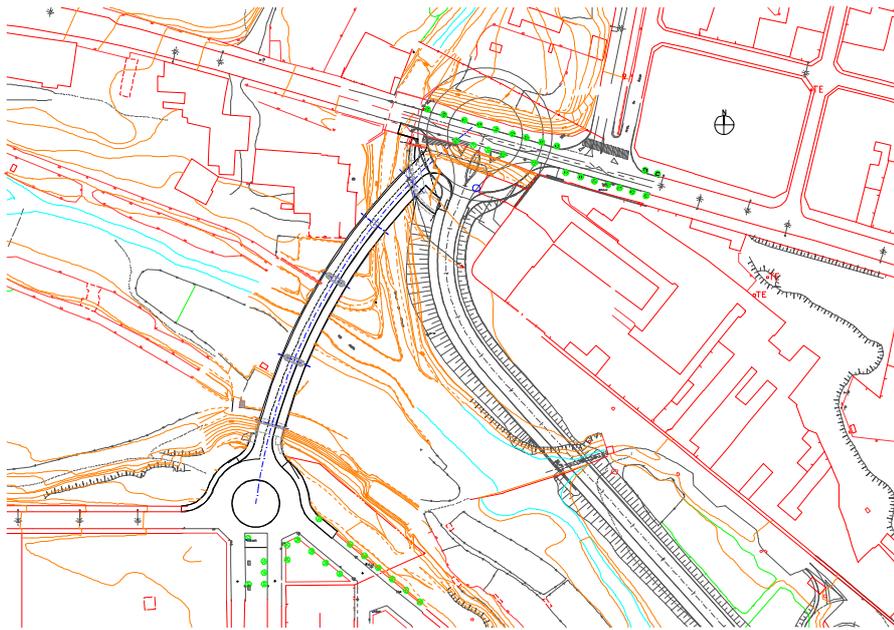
Ground Plan of the Bridge. Bottom: Roundabout at the Montbui side. Above: Future Roundabout at the side of Igualada and Rec Street.
